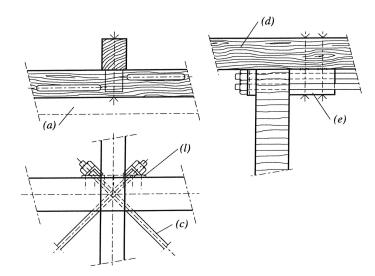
Connection of steel diagonals on the back side of the chords. (a) Braced beam, (b) nailed steel fitting, (c) steel bar, (d) purlin, (e) joint using timber block and connectors.
